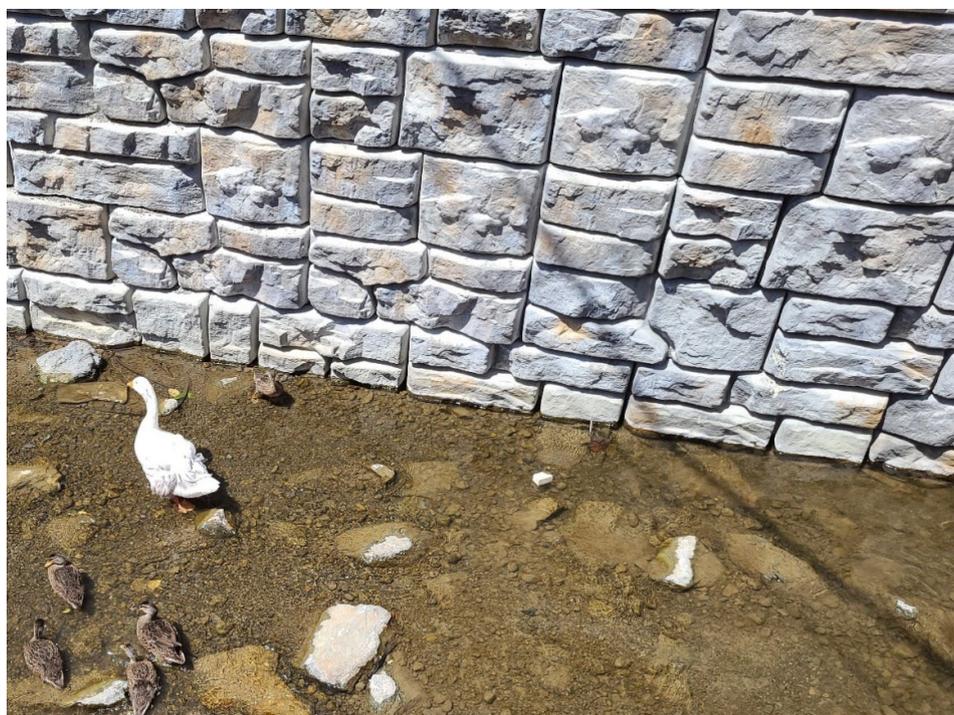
The Pinehaven Goose and some ducks enjoying the new Redi-Rock walls downstream of Pinehaven Culvert (photo credit: GHD)
